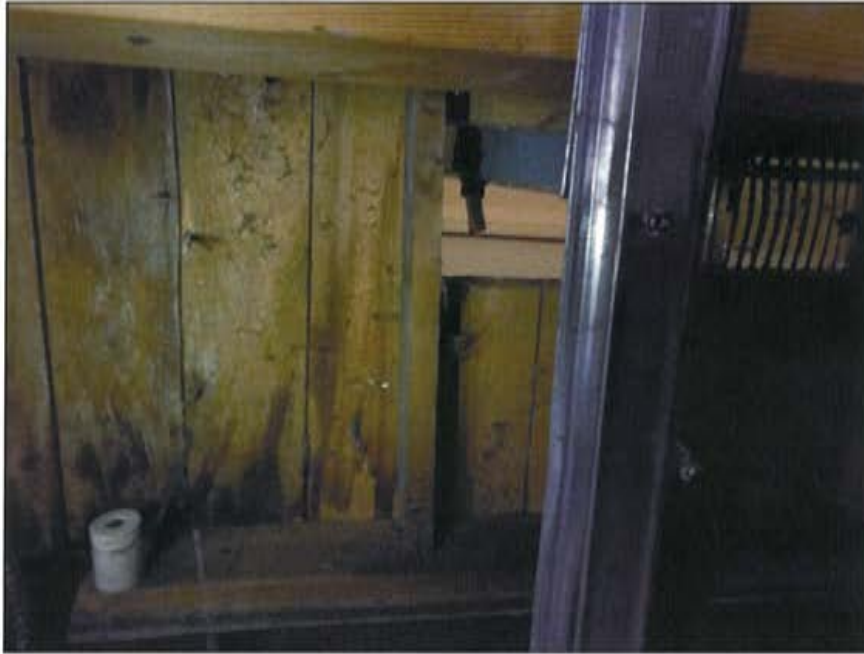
View from basement of location illustrated in Plate 39 showing floor joists, subfloor and hardwood boards on top of the subfloor, running in a direction opposite to the extant narrow hard wood flooring found in the Living Room.
